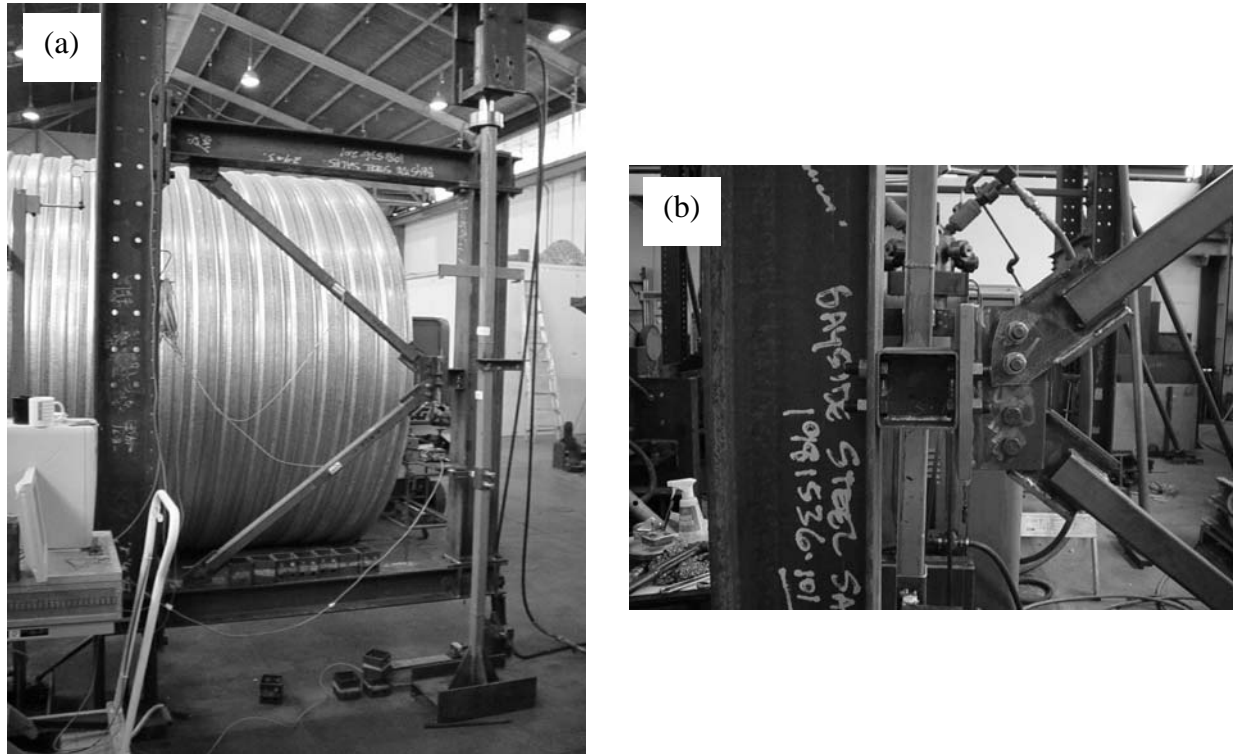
Test setup – (a) general layout and (b) device connection detail
